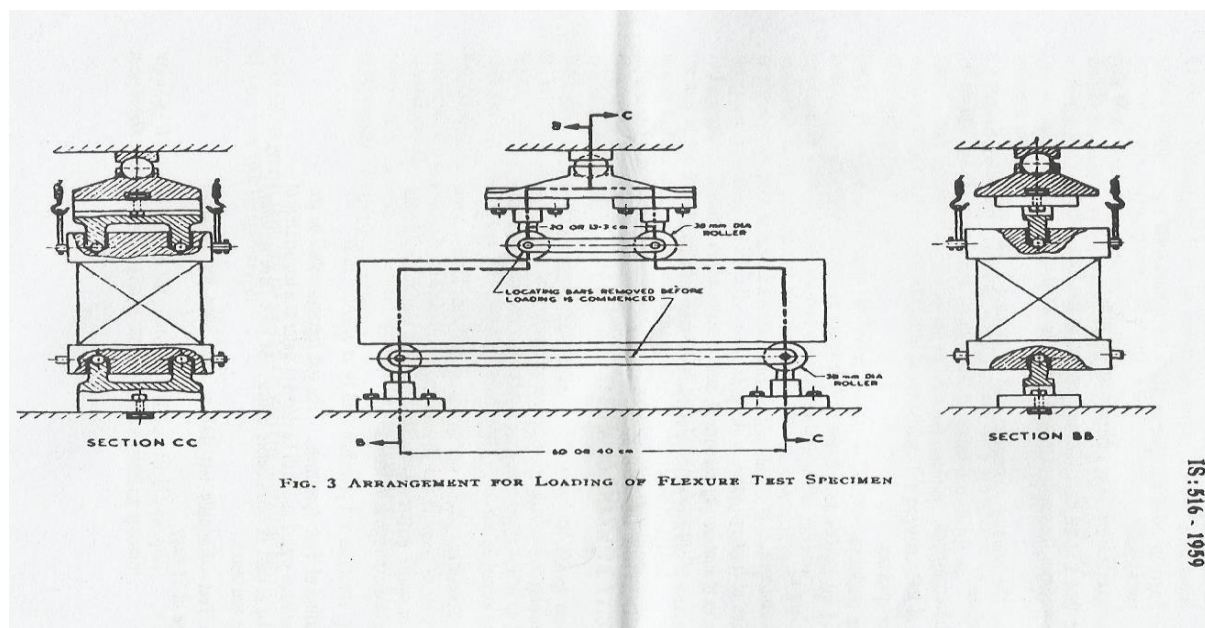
Arrangement for loading of flexure test specimens as per IS : 516 - 1959
